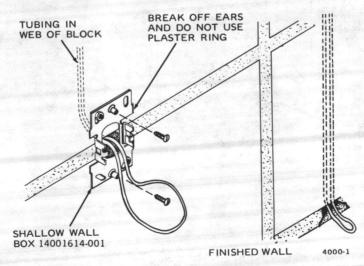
Installing Shallow Wall Box on Finished Block or Glazed Tile Wall.
